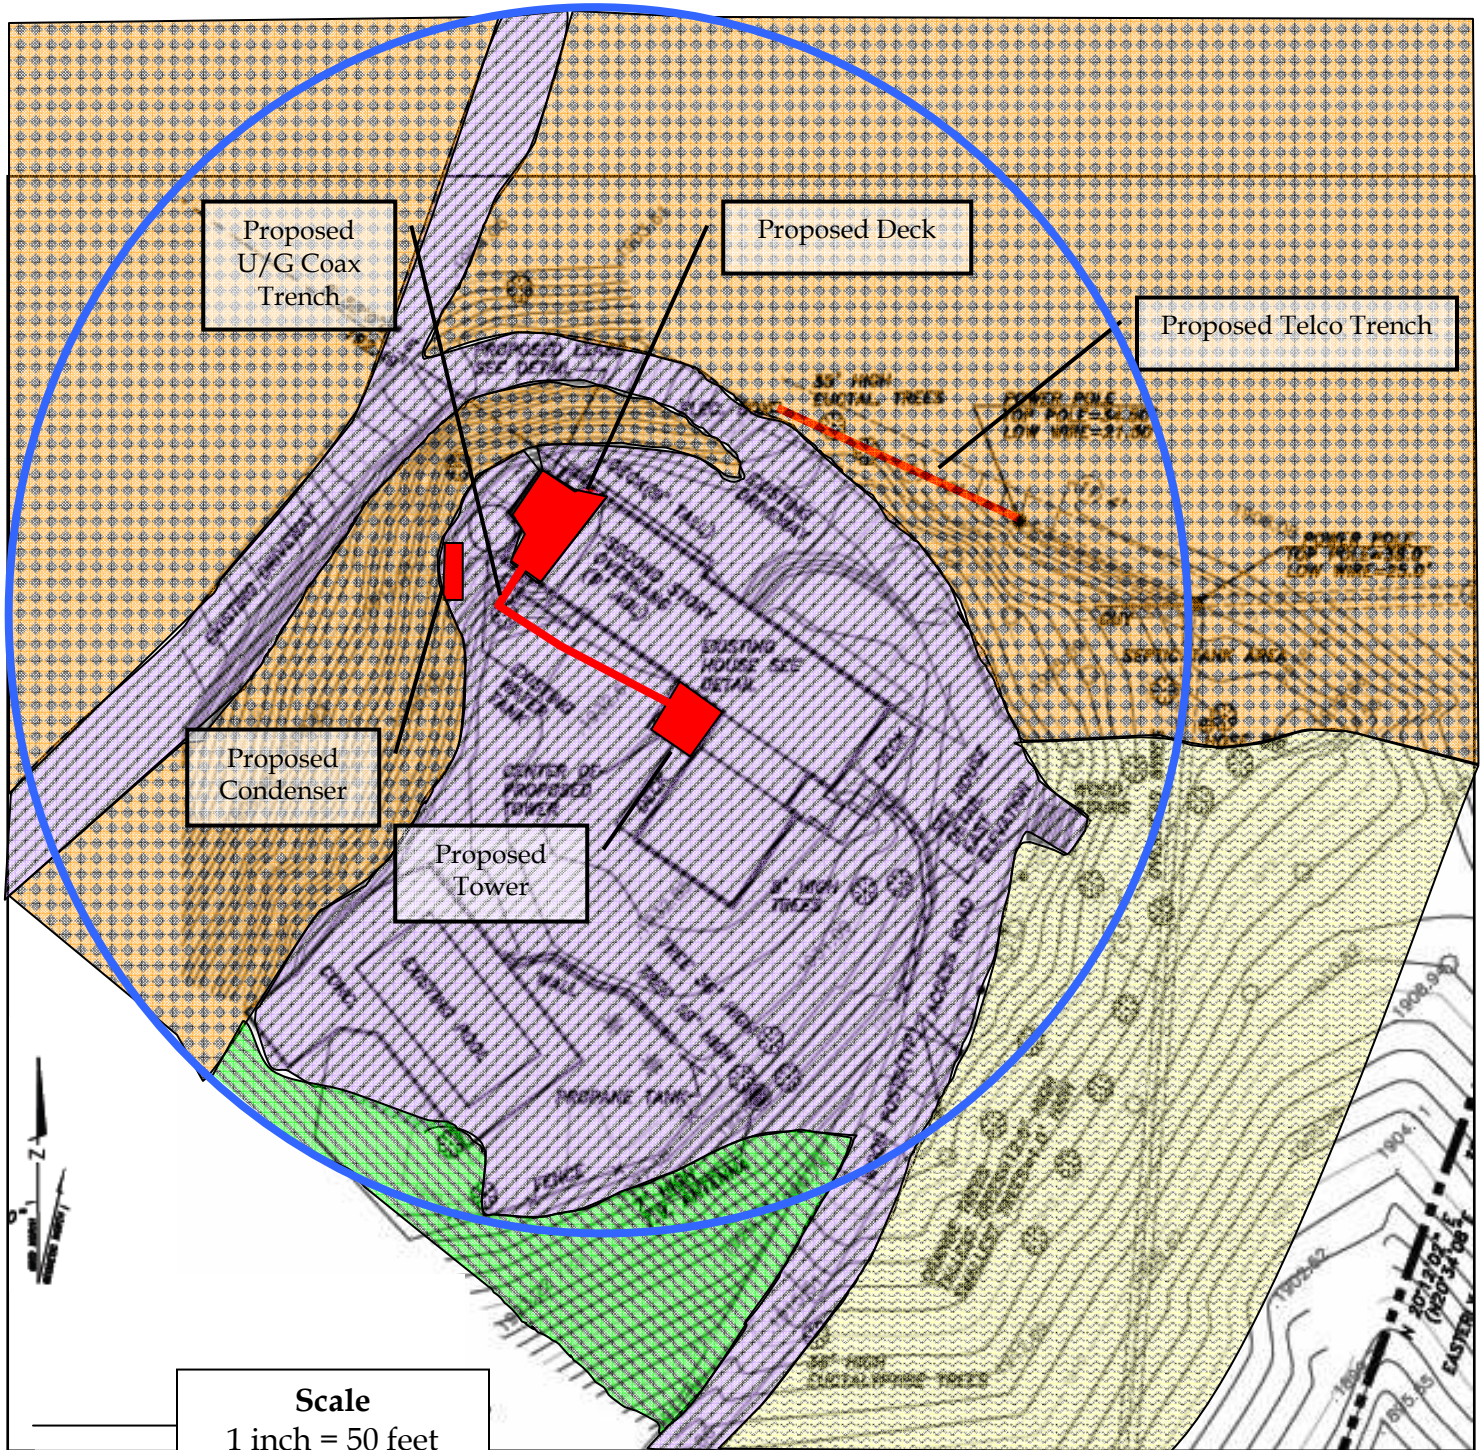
Site Plan showing Habitats - Sprint/Nextel "North Jamul" Wireless Facility, CA5178A
